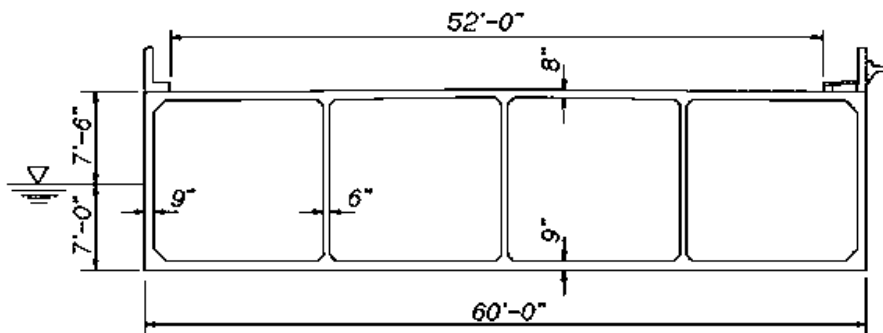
Cross-Section of Typical Pontoon, Evergreen Point Floating Bridge
